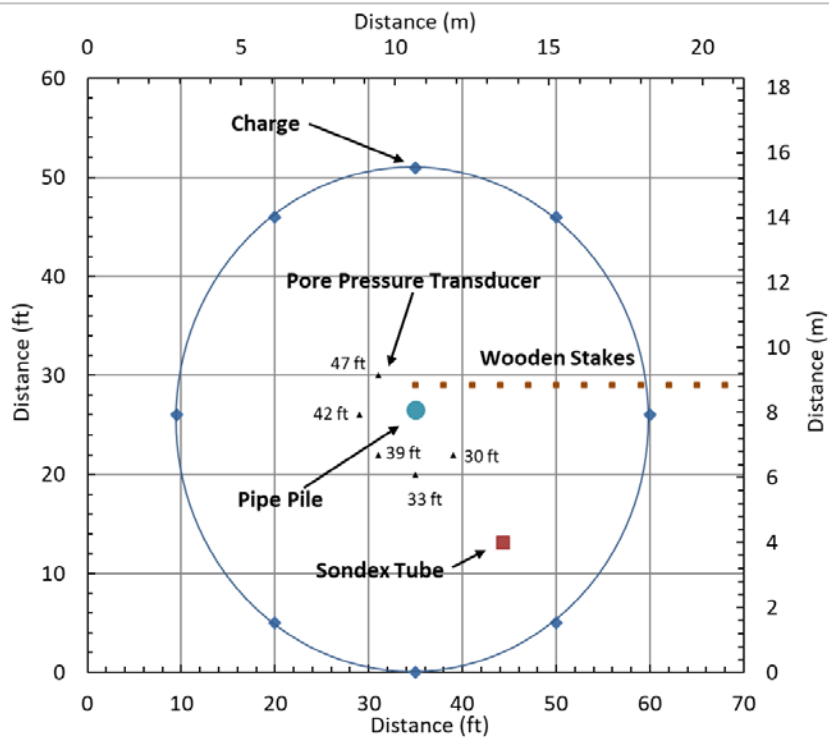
Plan view drawing for a typical test blast showing drilled shaft and driven test piles, blast holes, and instrumentation.
